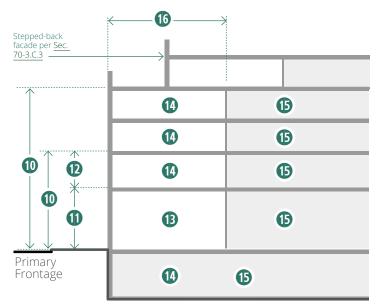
C-3. Storefront Building Section: Height & Use Requirements
